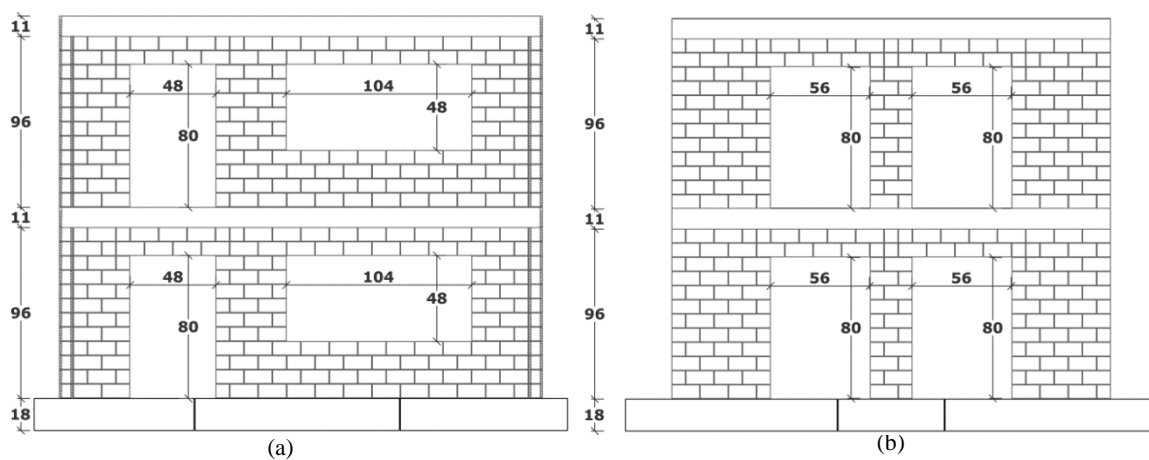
Specimen configuration: a) Elevation view of the interior wall. b) Elevation view of an exterior wall. All the dimensions are in inches (1 in. = 25.4 mm)
